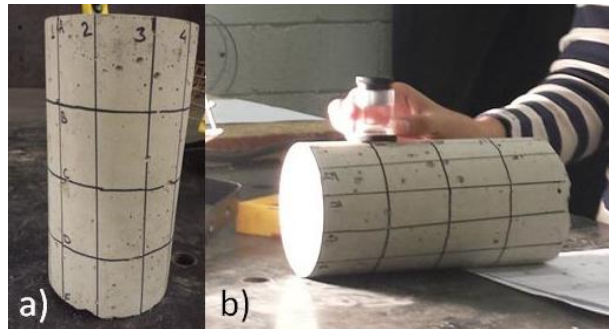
(a) grid on a specimen, (b) crack width measurement using magnifier
